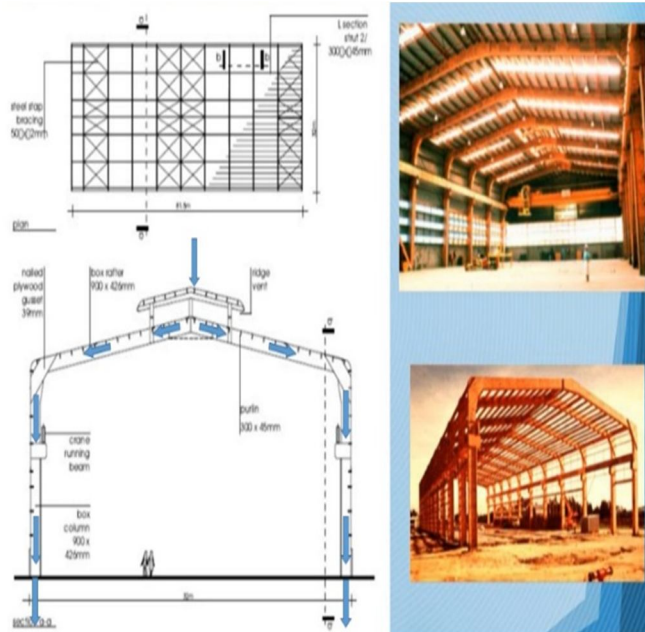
Basic timber portal frame plan and section, source: [slideplayer.com](http://slideplayer.com)
